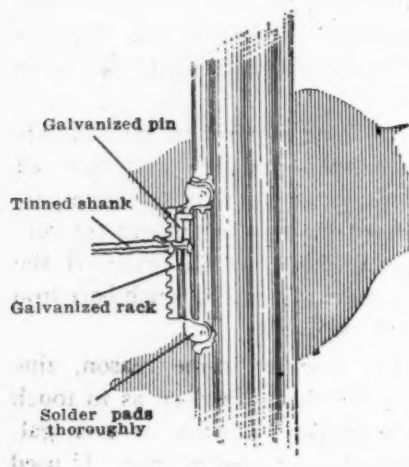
Best Method of Supporting Zinc Conductor Pipe. Use Galvanized Rack Type Fastener with Galvanized Pin and Tinned Wall Drive or Shank. One Fastener to Each Length of Pipe.
